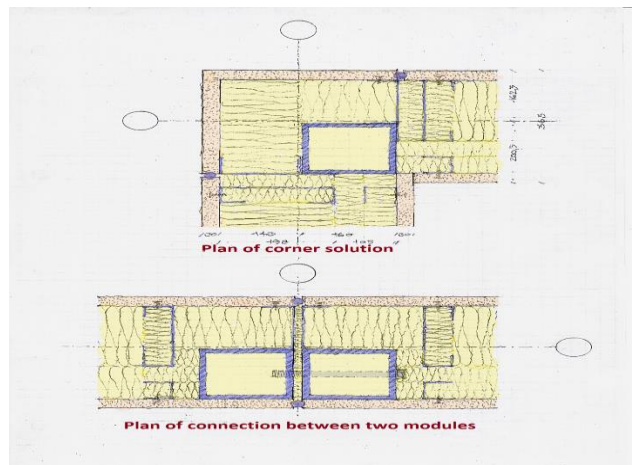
Corner of external wall as a separate component (Barrett, 2016)
